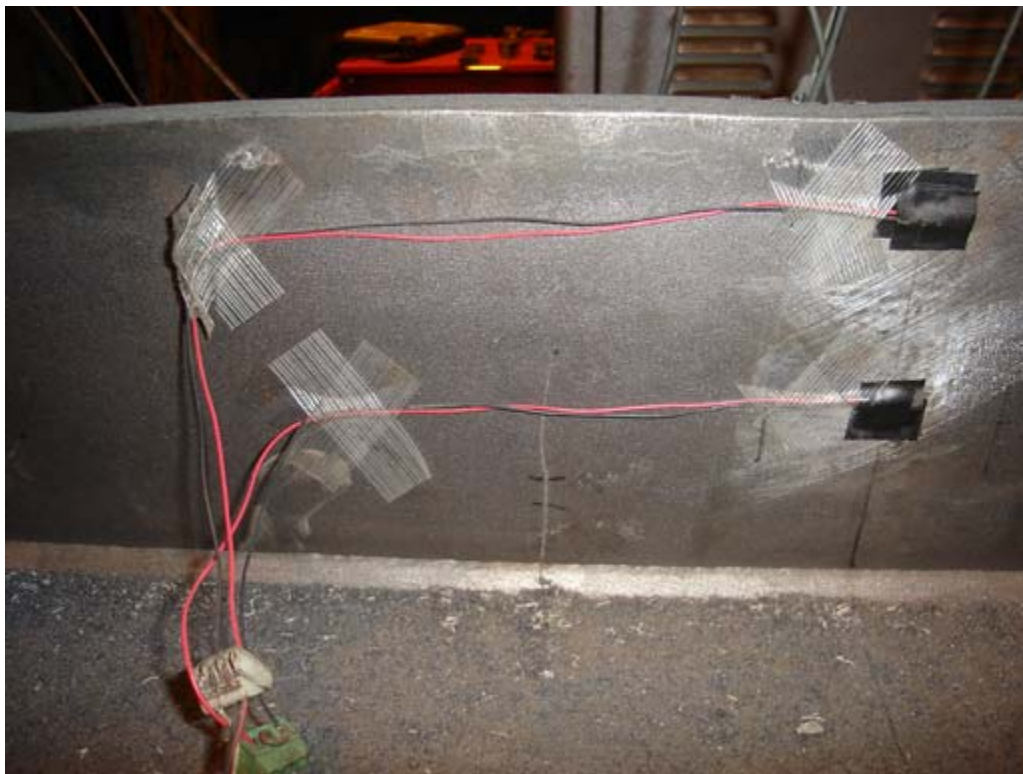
Typical crack in reaction beam between the two supports.
